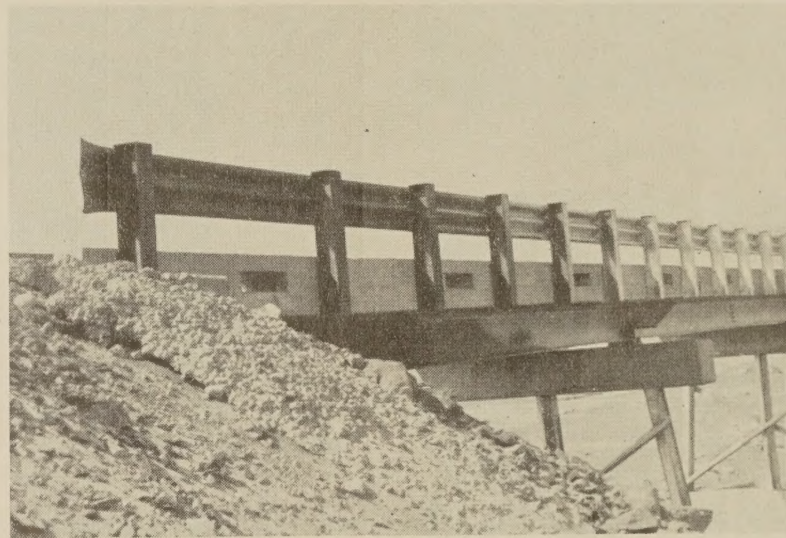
Severe paint erosion on guardrail of east end of Mile 27 Bridge.
